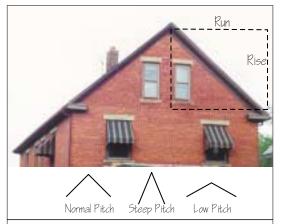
New construction should maintain a similar roof line and pitch found on the existing houses.
